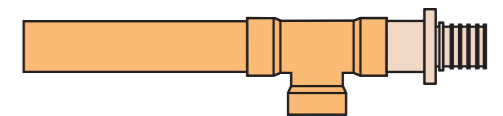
Soldering/Pressing adapter RAUTITAN RX+ soldered into a copper piping system
